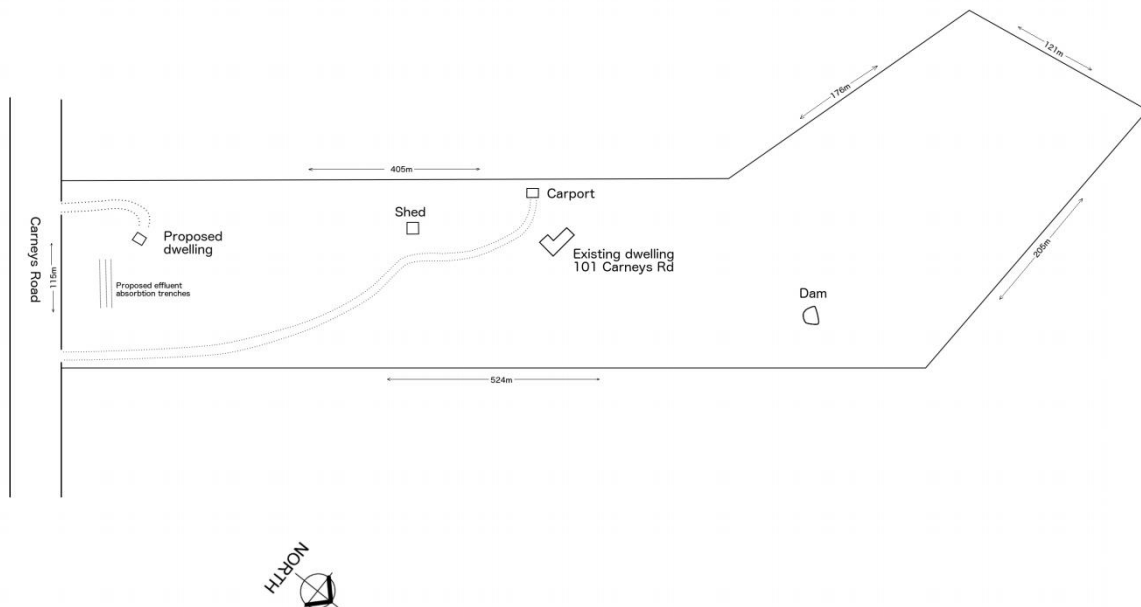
Site Plan, Floor Plan and Elevations for the proposed dwelling.
